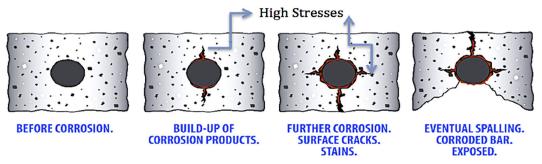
Corrosion propagation in steel rebar and concrete spalling (source: http://www.frpdistributors.com/).
